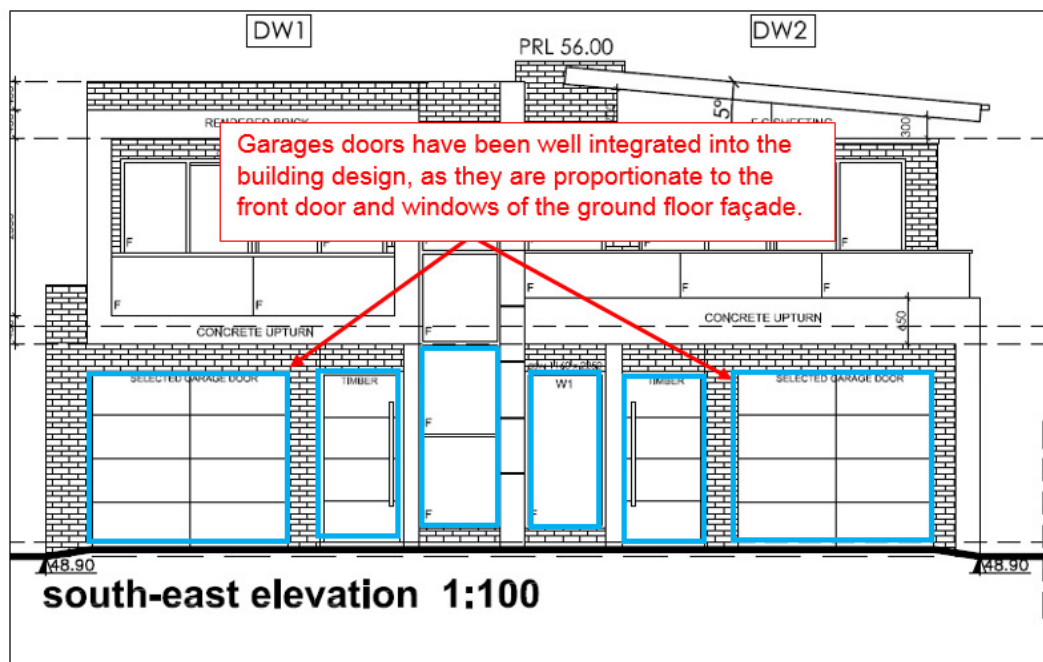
This diagram demonstrates how the garages are integrated into the overall design of the dwelling with the ground level of the dwelling still capable of addressing the street with front doors and windows orientated toward Fairview Street.
